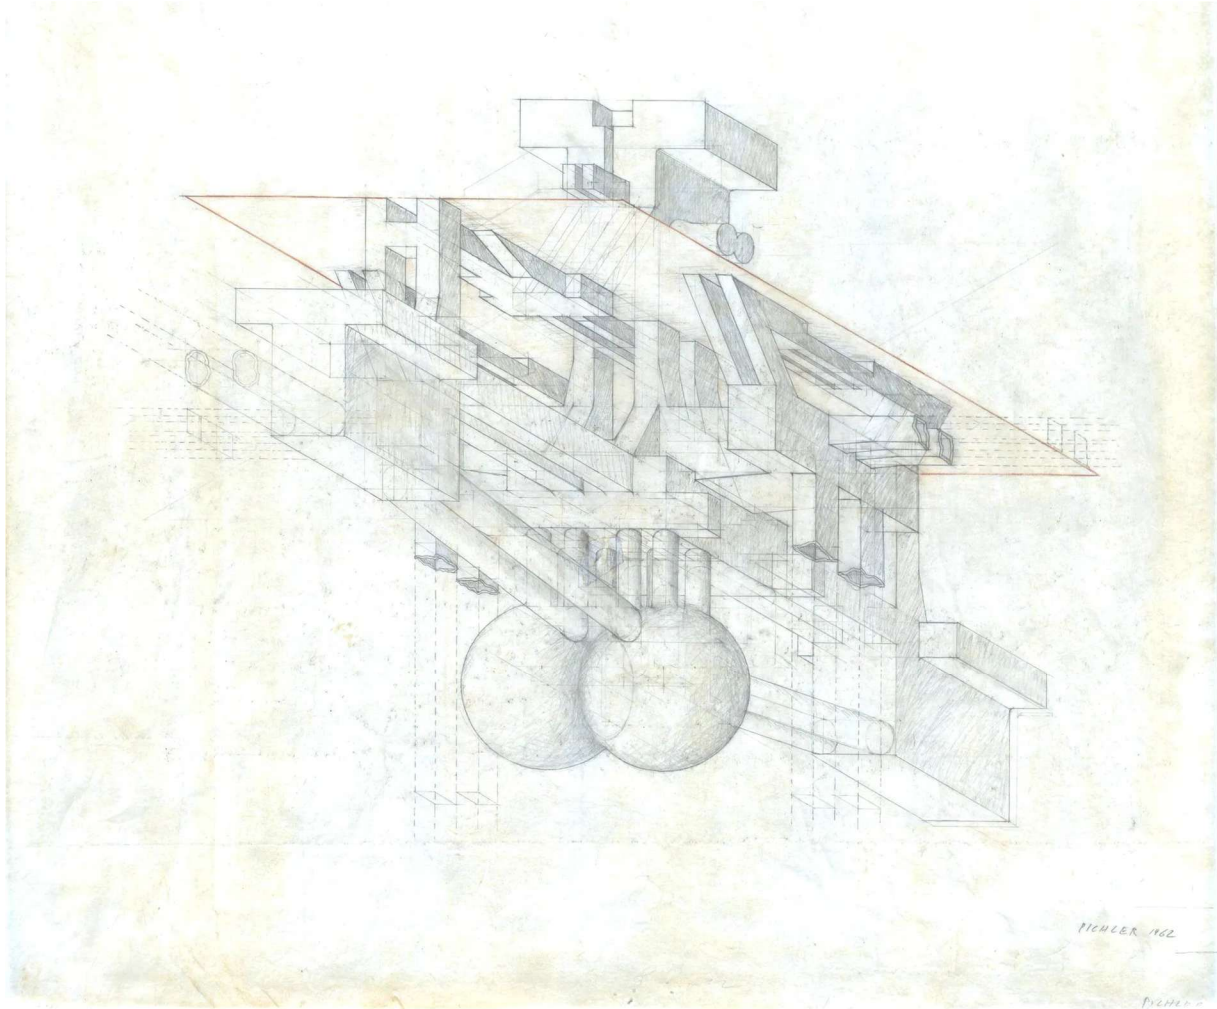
Nucleus of an Underground Building (Walter Pichler, 1962)
